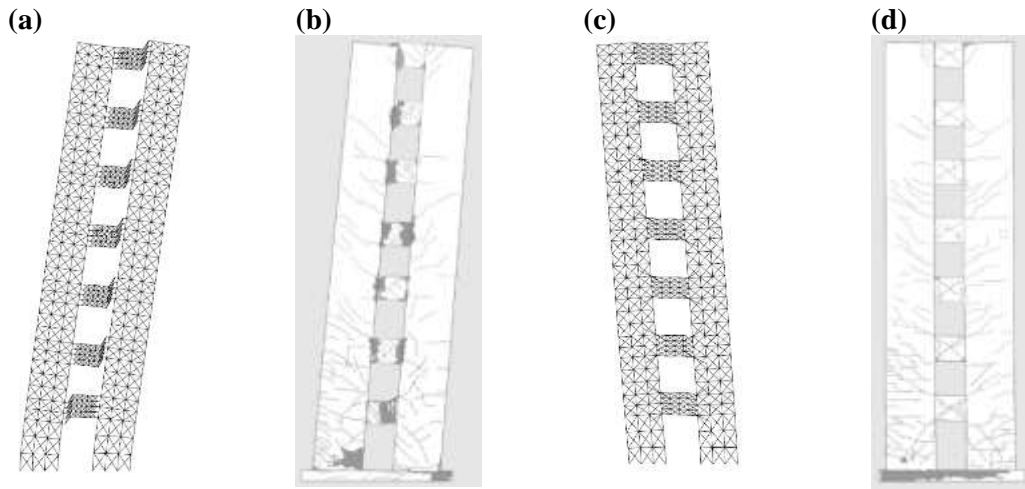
(a) EBTM deformed the shape of specimen Wall A at maximum drift ratio (2x). (b) Specimen Wall A at the end of the test. (c) EBTM deformed the shape of specimen Wall B at maximum drift ratio (2x). (d) Specimen Wall B at the end of the test. The images of the model were created with the program STKO (Petracca et al. 2017a, Petracca et al. 2017b).
